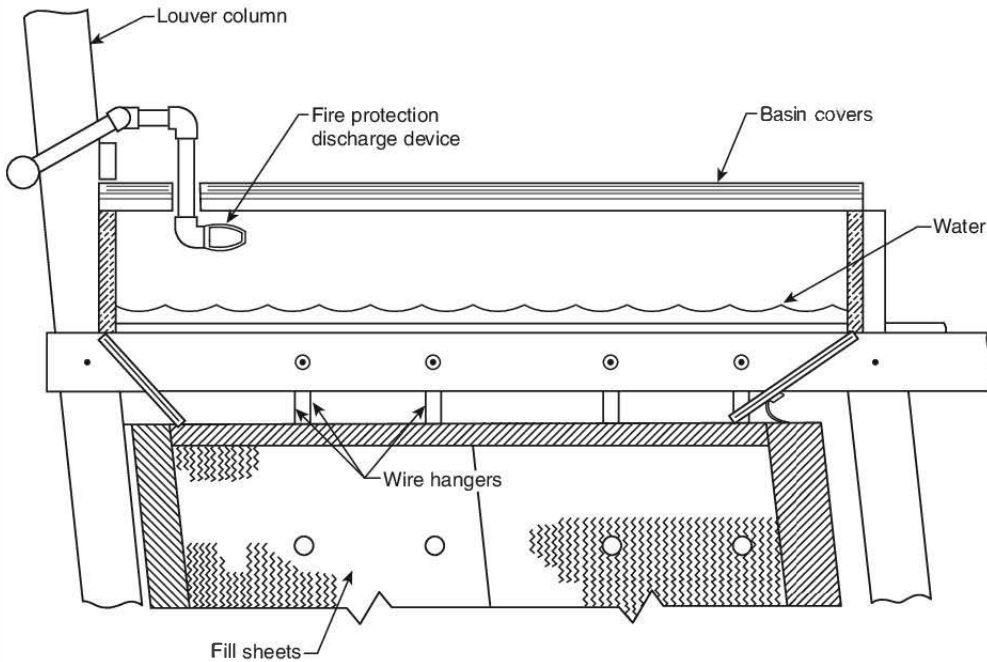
Typical Deluge Fire Protection Arrangement for Crossflow Towers with Covers Completely Enclosing Distribution Basins.
